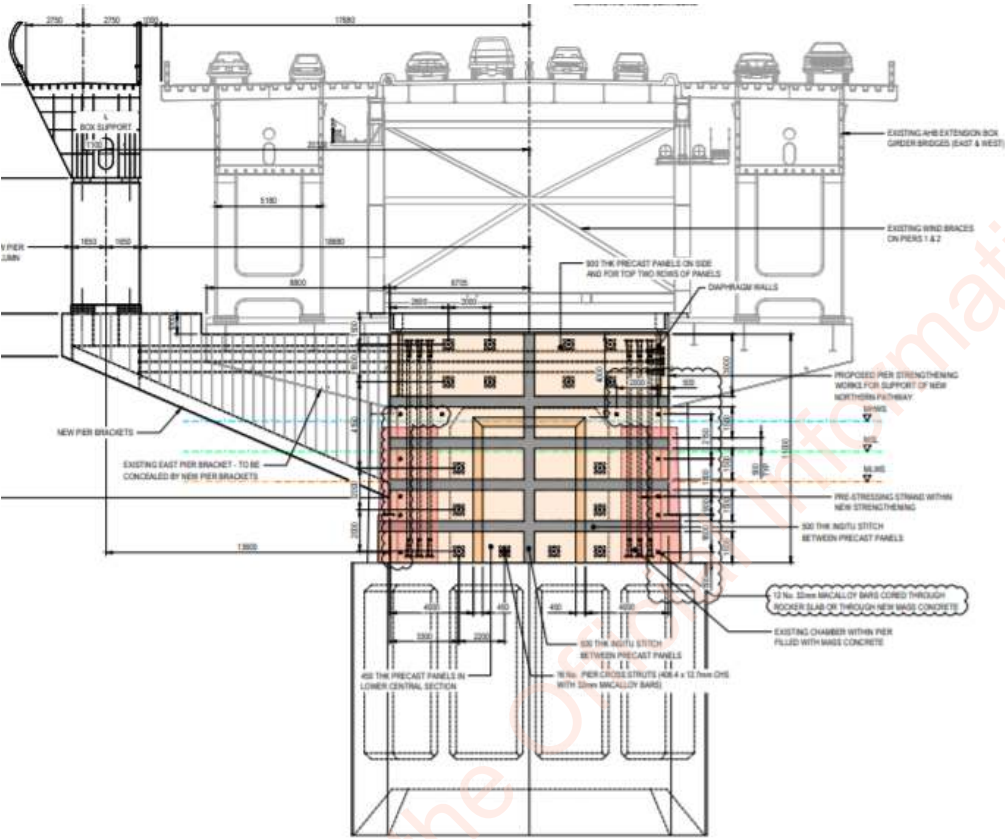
Elevation of Pier 6 showing pier bracket connection below water level
